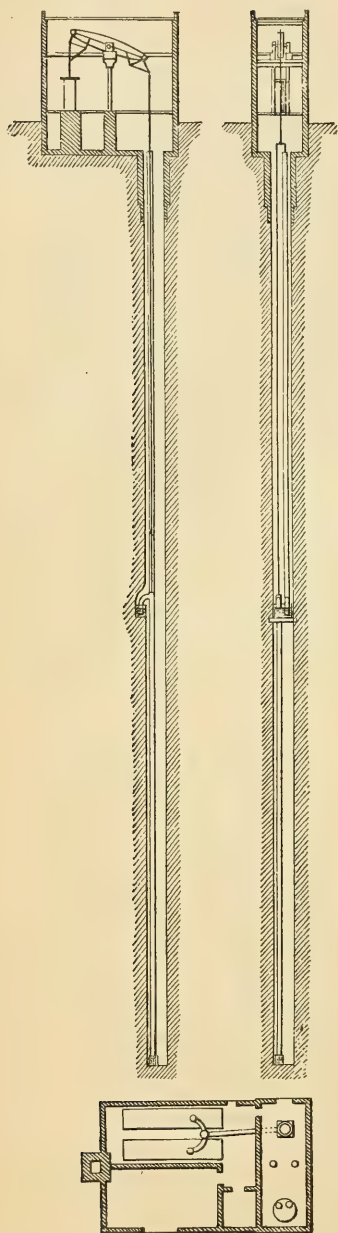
Engine at Goldthorn Hill Waterworks. Elevations and Plan.
